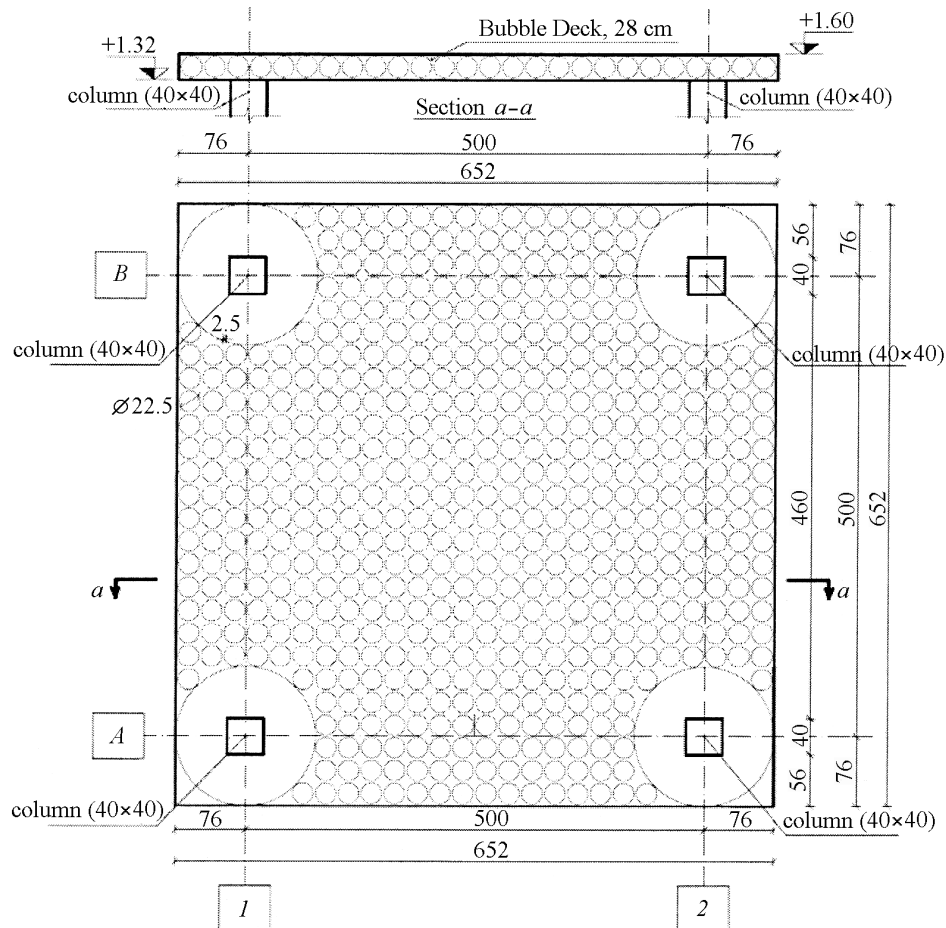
Formwork plan for Bubble Deck experimental element.
